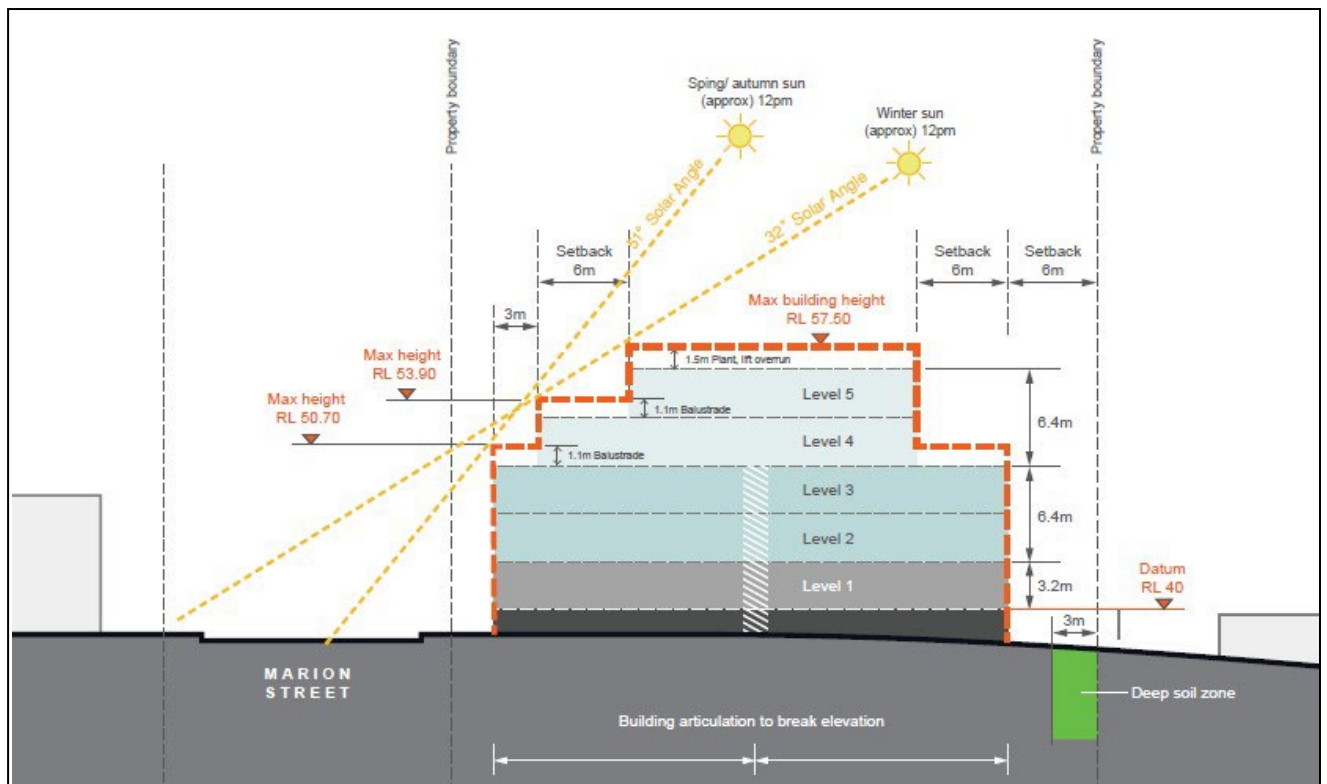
Building Heights and Massing Envelope – Section A (north-south)
